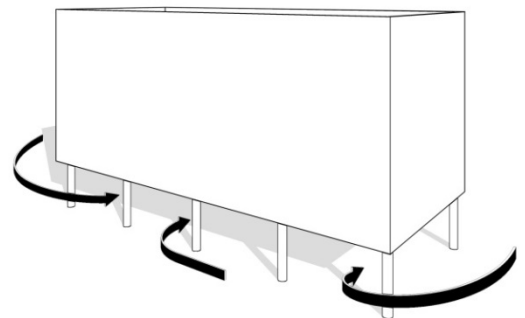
Illustration showing the concept of buildings elevated on columns (*pilotis*)
